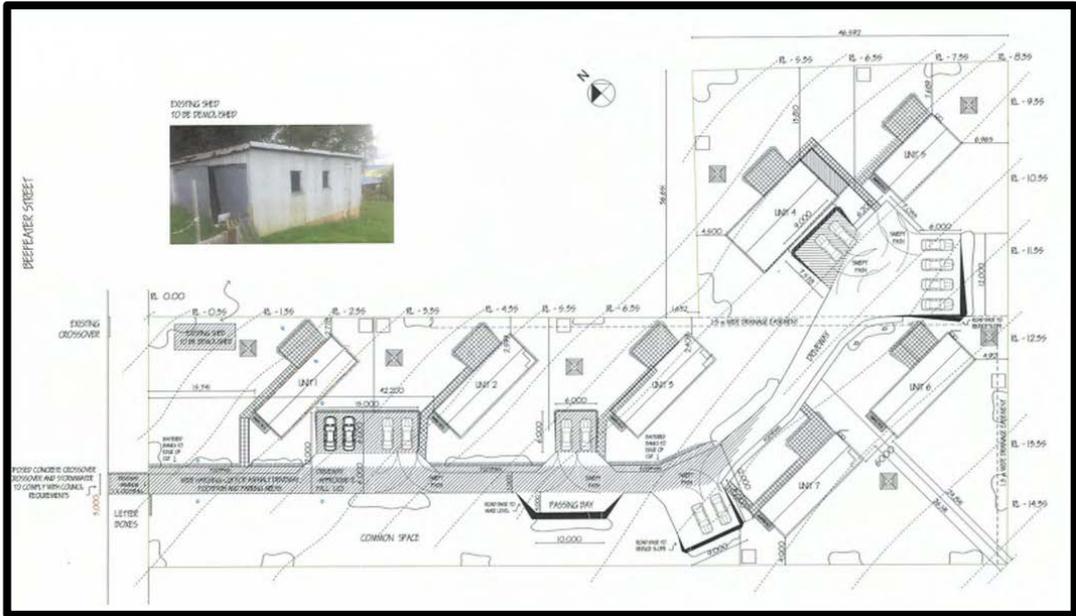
proposed site plan (source: Adorn Drafting) - detailed plans attached
